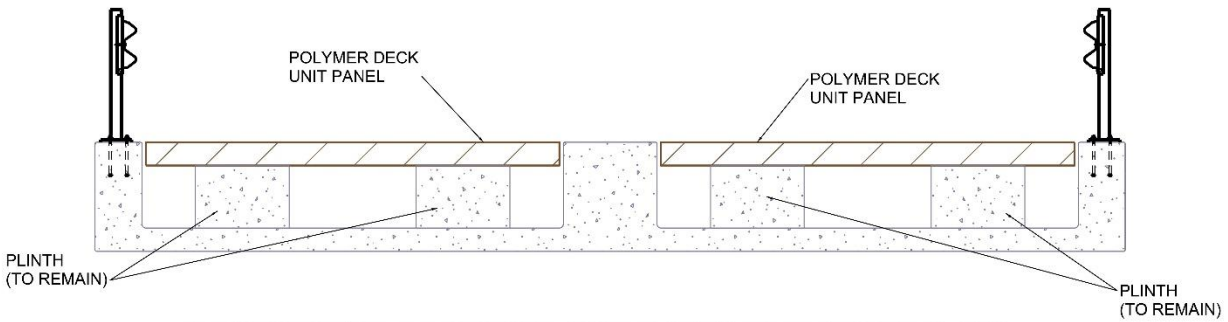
Potential Retrofit Bidirectional Deck System
